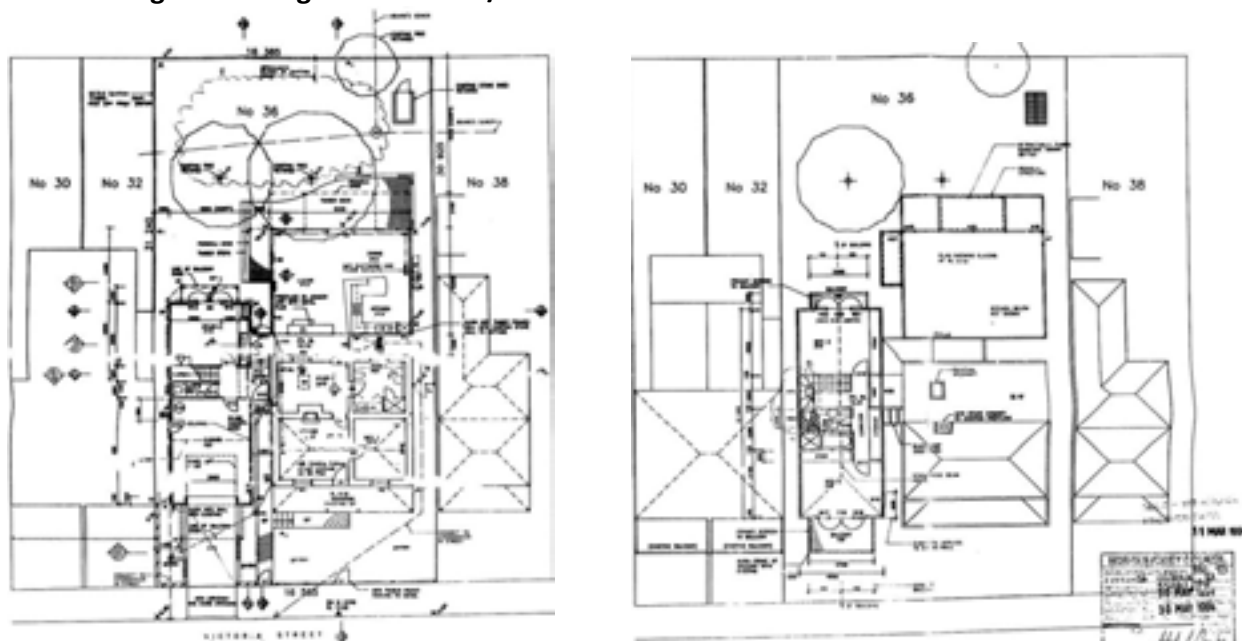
(Left): Approved Site/Ground Floor Plan DA1131/93/2
